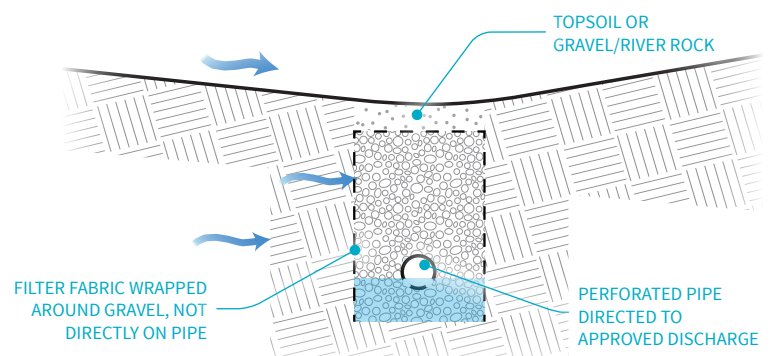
Schematic cross section of a French drain with topsoil cover.
